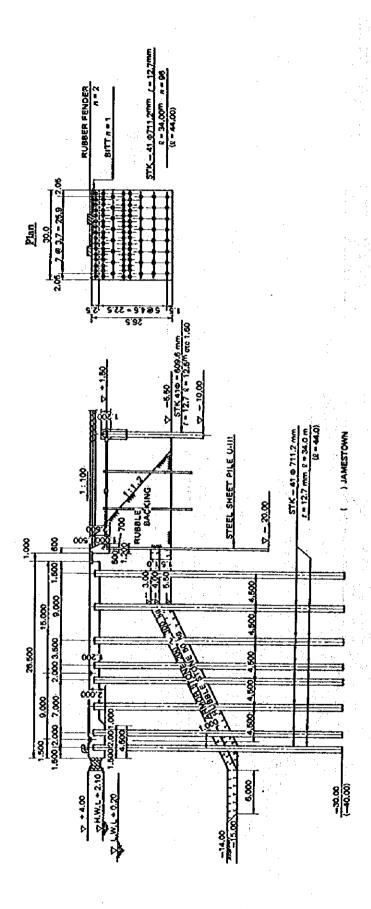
Typical Section of Bulk Cargo Wharf (Jamestown, Opobo)
